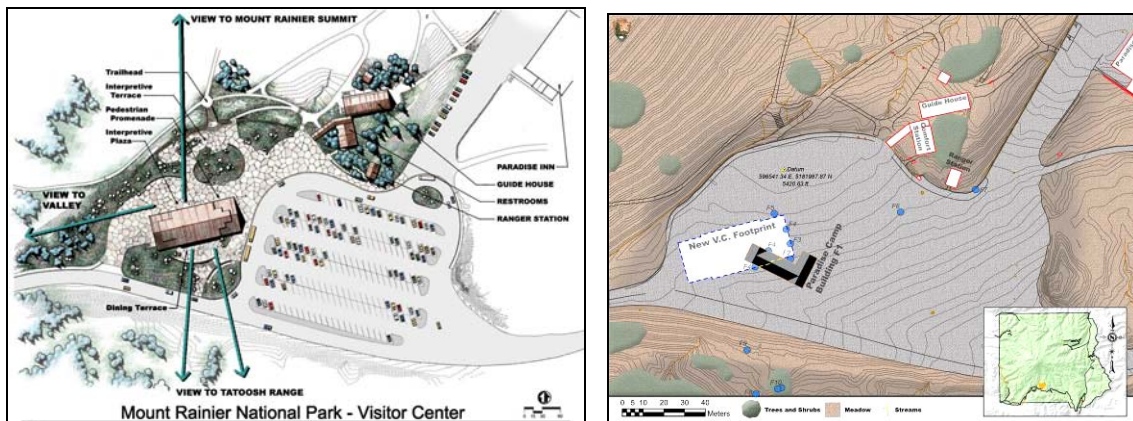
Jackson Visitor Center 2002 Site Plan and Position of Paradise Camp Lodge
